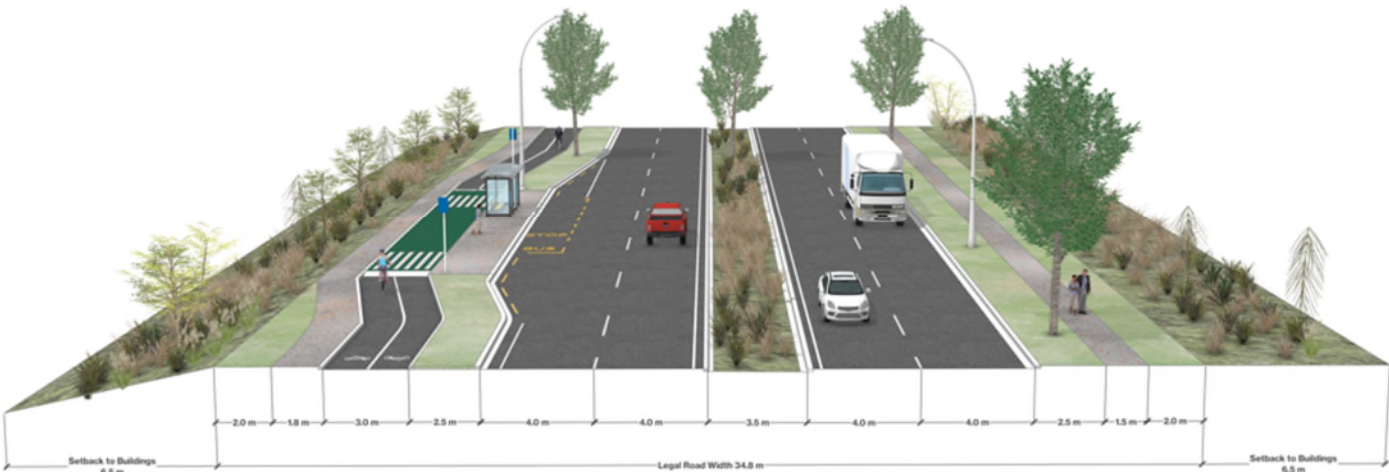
b: Indicative Typical Cross Section of the ultimate Northern River Crossing (Arterial), following upgrade of East-West Road
